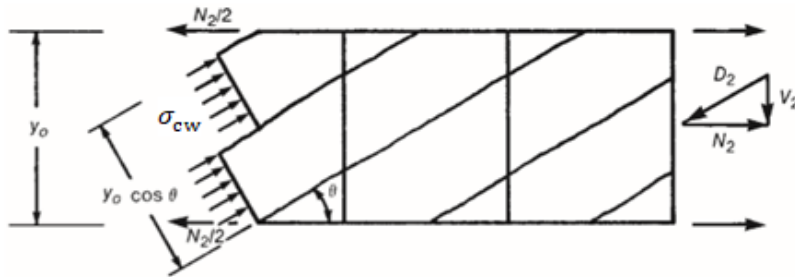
Section of a vertical wall of the truss detailing the chords and struts forces [12].
